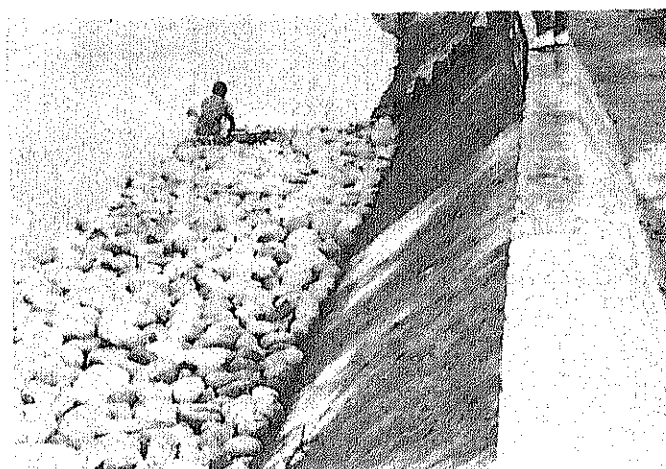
Parapet revetment with foot protection (no damage)
